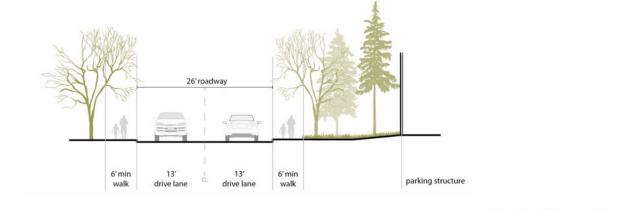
PRIMARY PRIVATE STREET ALTERNATIVES - TYPICAL STREET SECTIONS
